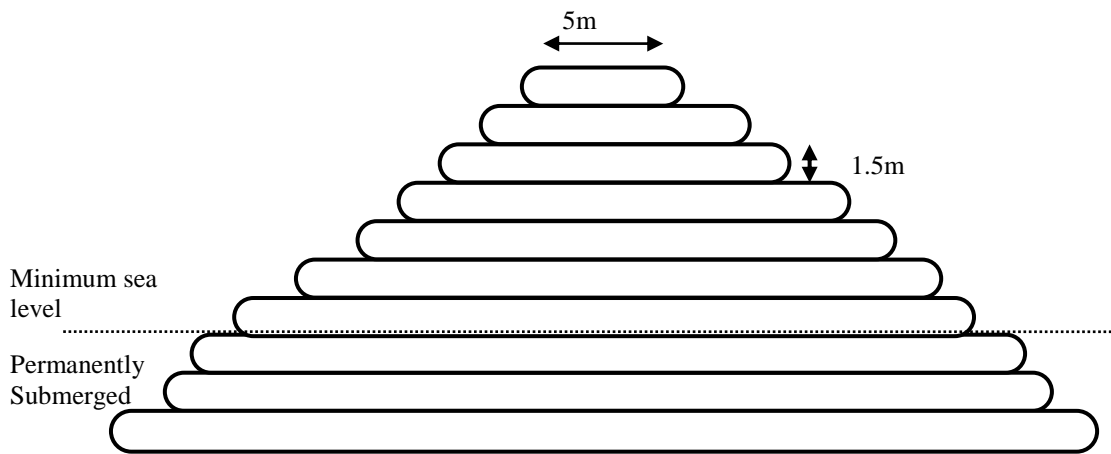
Cross-section of impoundment wall using geomembrane bags
